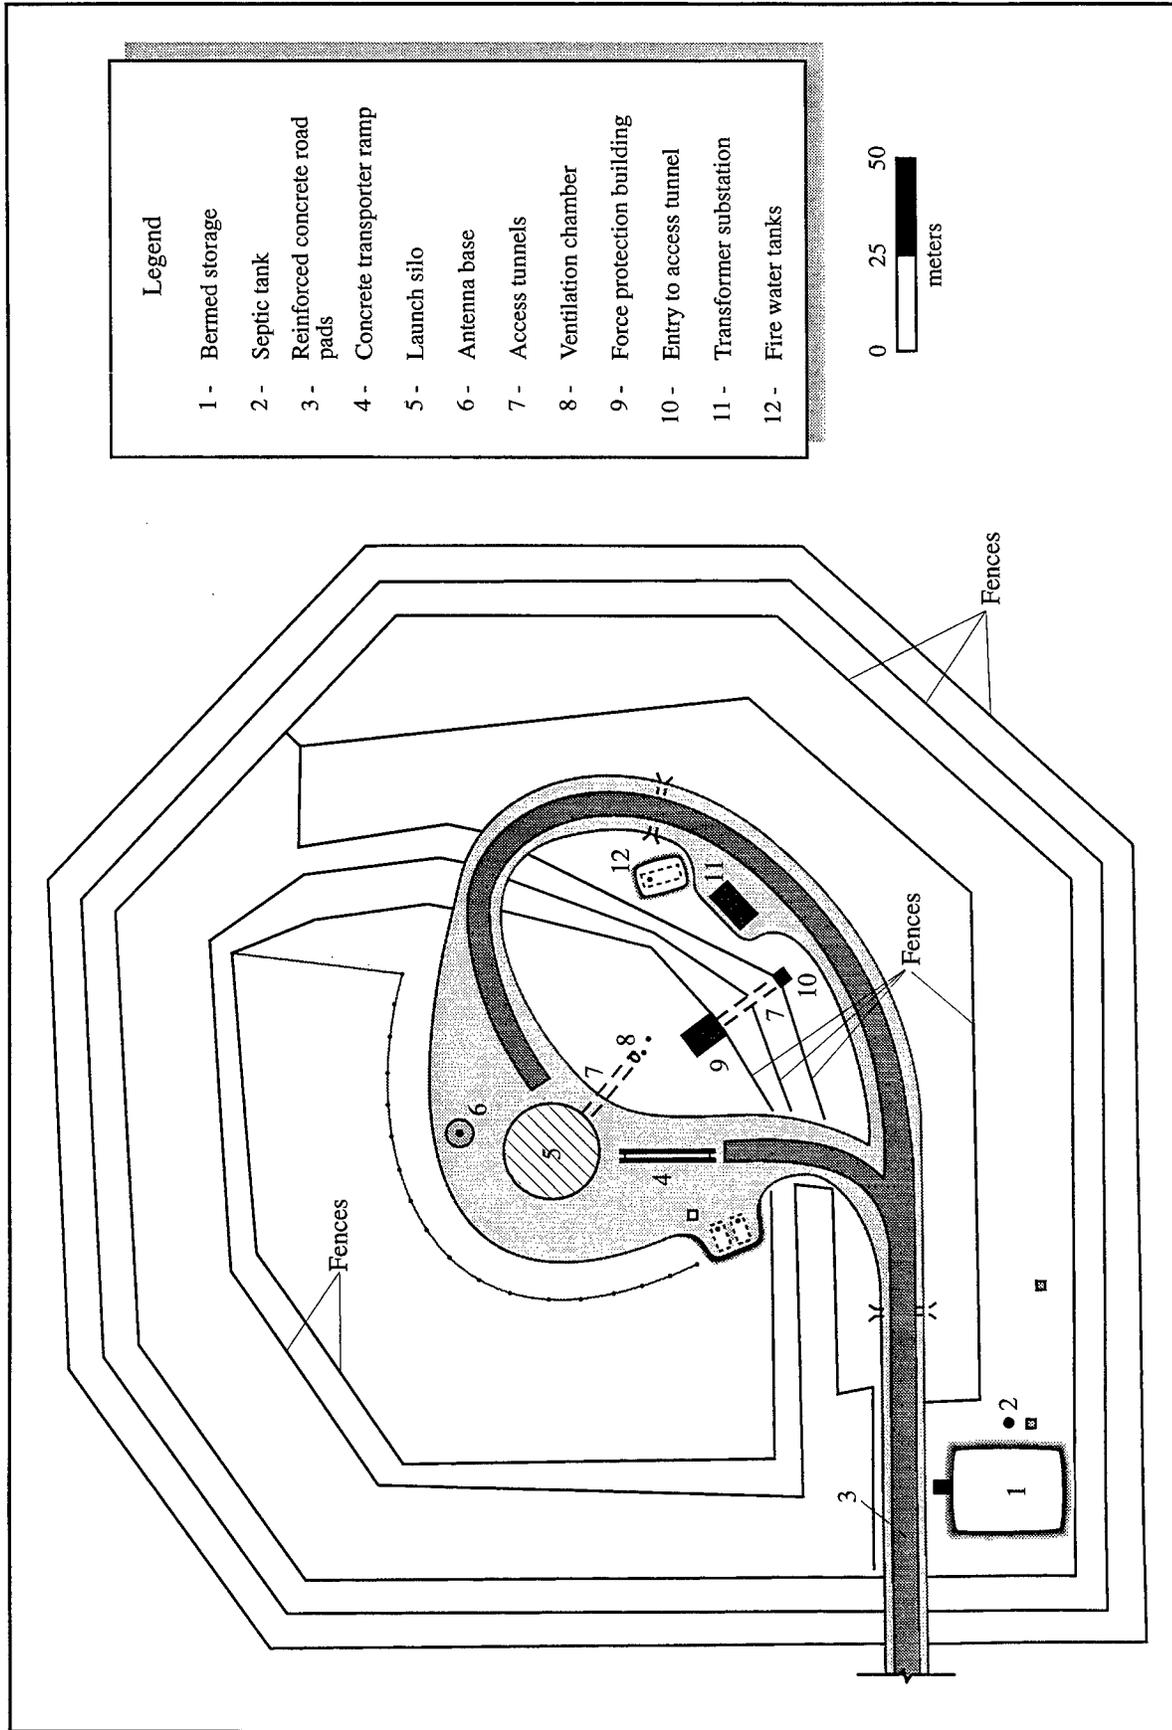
Plan drawing of a typical stand alone launch silo (LS) site. Derzhavinsk, Regiment 2, Silo 3.
